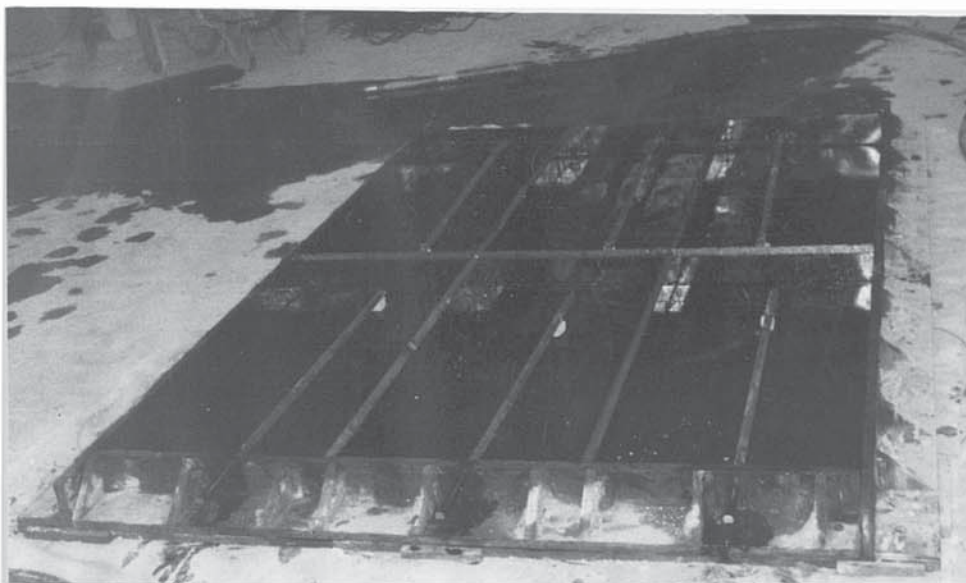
Empty Mould Internally Subdivided into Six Sections, and 20 mm  $\varnothing$  reinforcing bars in position
